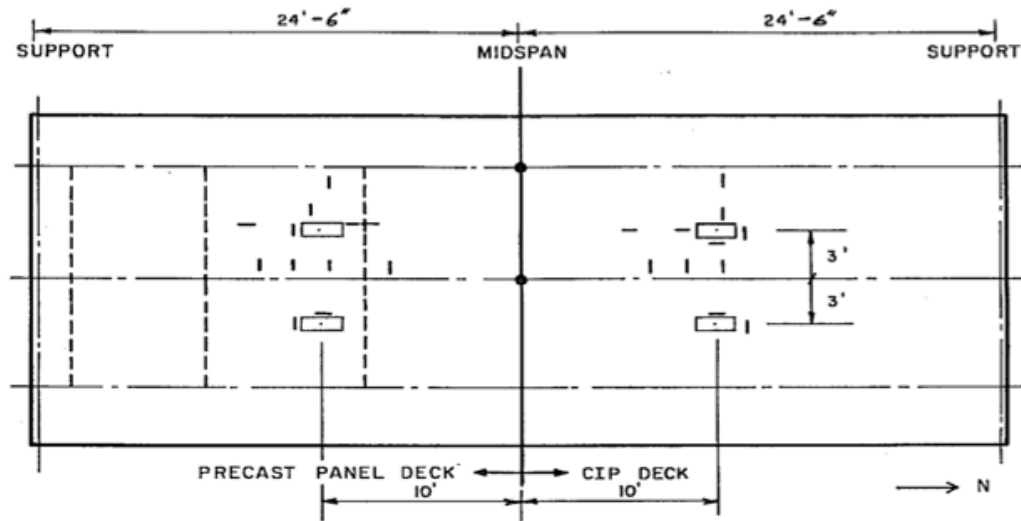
Fang et al. [39] layout of the experimental bridge
